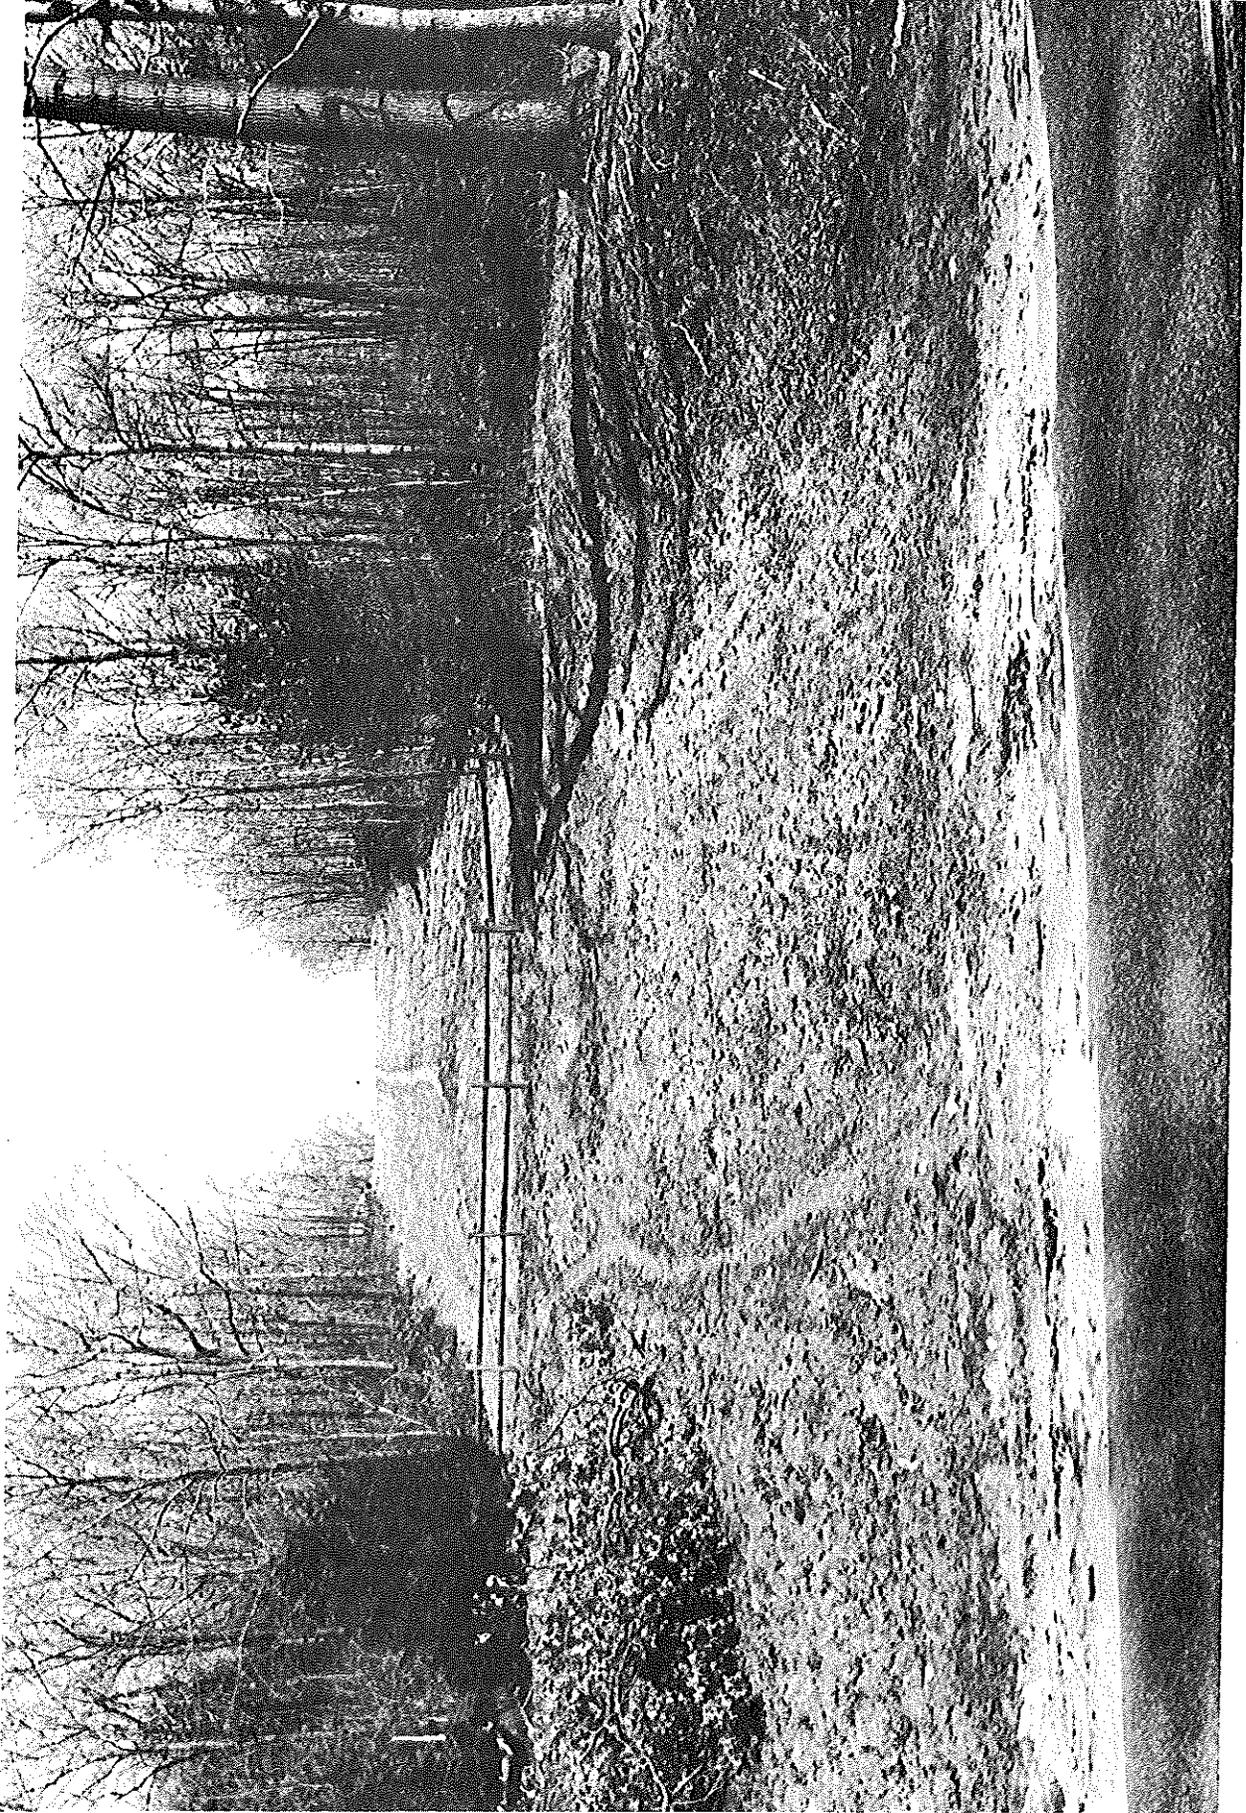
Right-of-way for 138-kV underground cable installation six years after construction.
